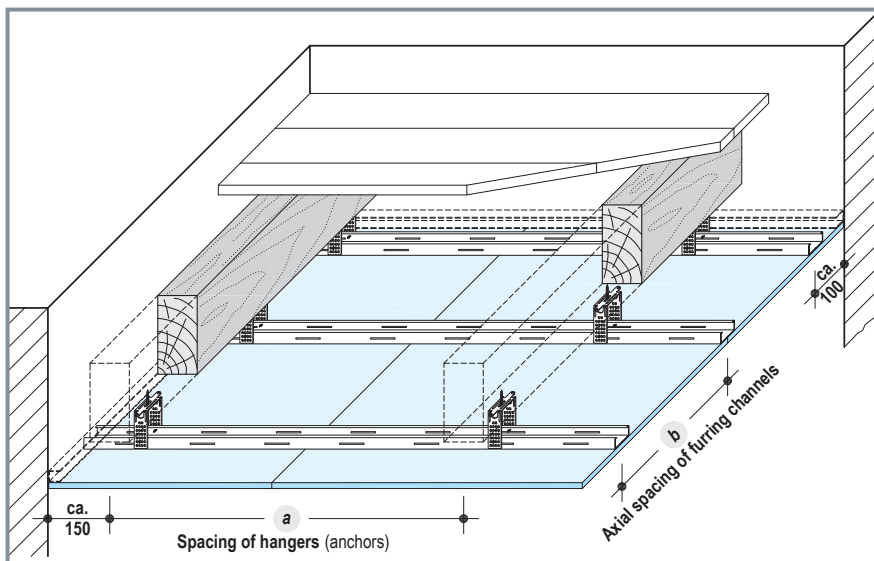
Spacings of the substructure, consisting only of furring battens/channels
